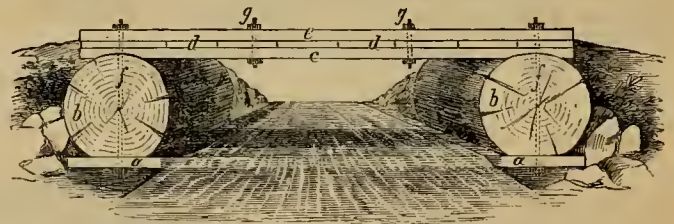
CHEAP AND SUBSTANTIAL BRIDGE.
